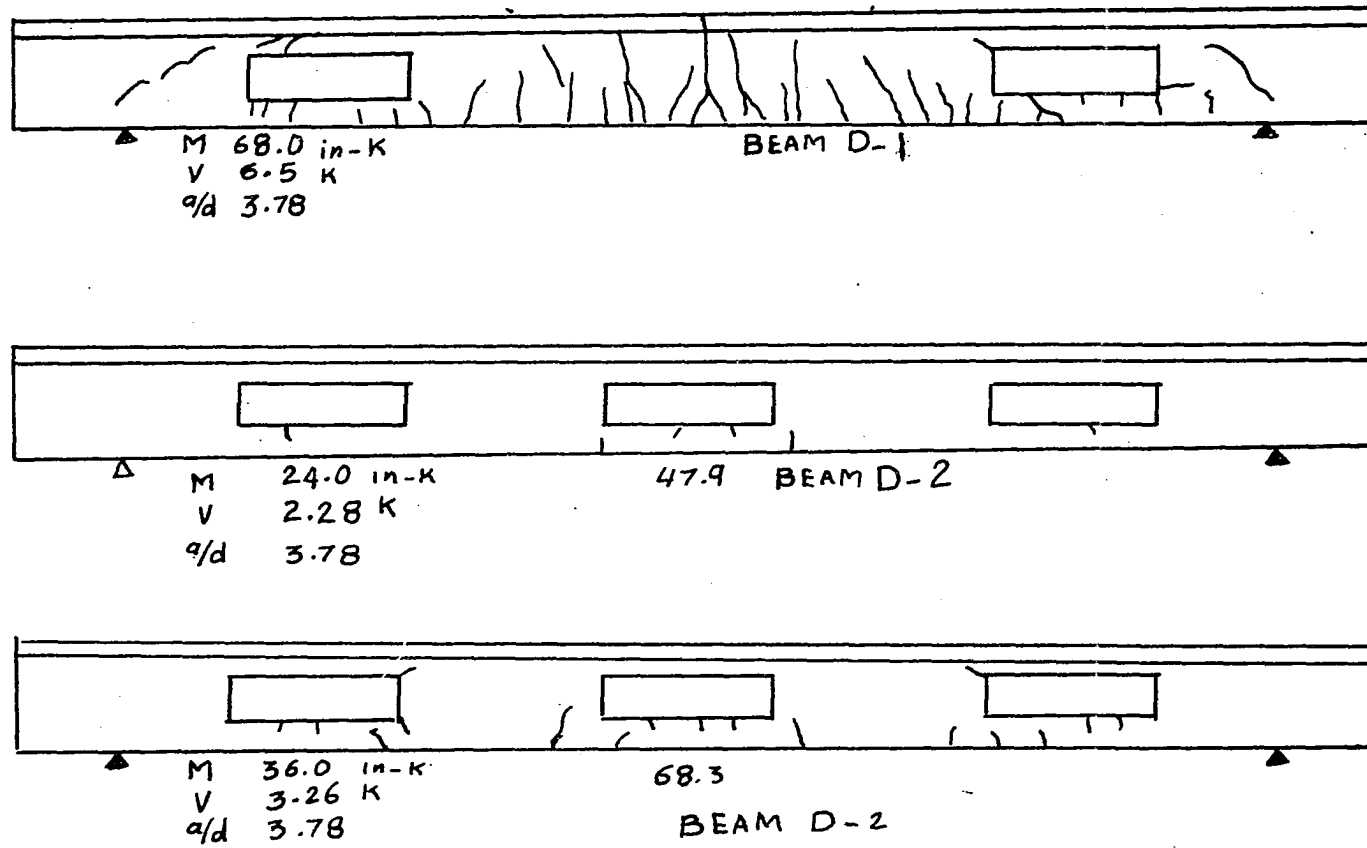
Cracking Versus Bending Moment and Shearing Force for Beams D-1 and D-2.
